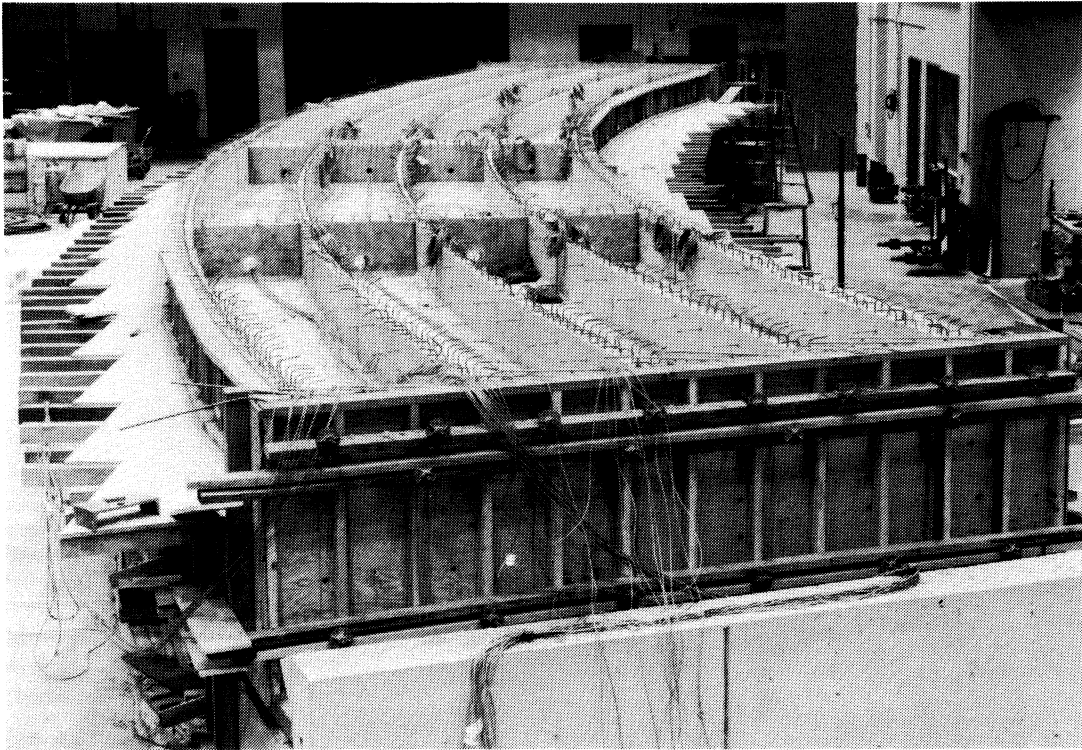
FORMS FOR BOTTOM SLAB, GIRDER WEBS AND DIAPHRAGMS READY FOR CASTING OF CONCRETE
